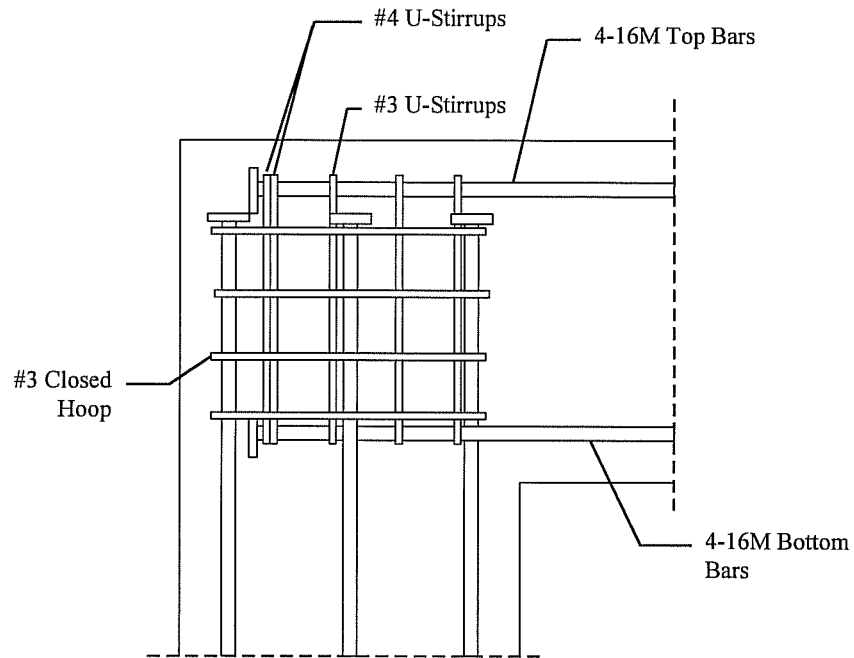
Reinforcement Details of Knee Joint tested by McConnell and Wallace [7]
